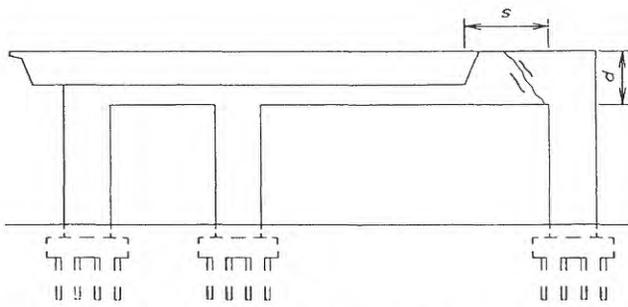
Damage to Bent A-32 of China Basin Viaduct.
